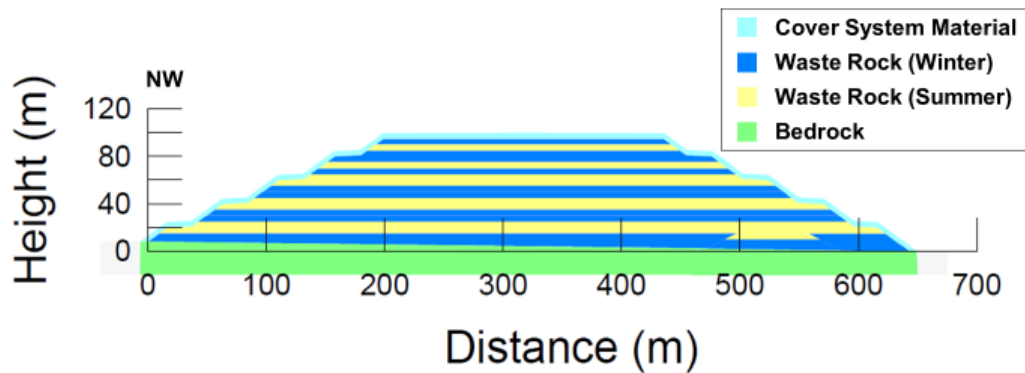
Northwest-Southeast cross-section through Whale Tail WRSF at closure (A).
